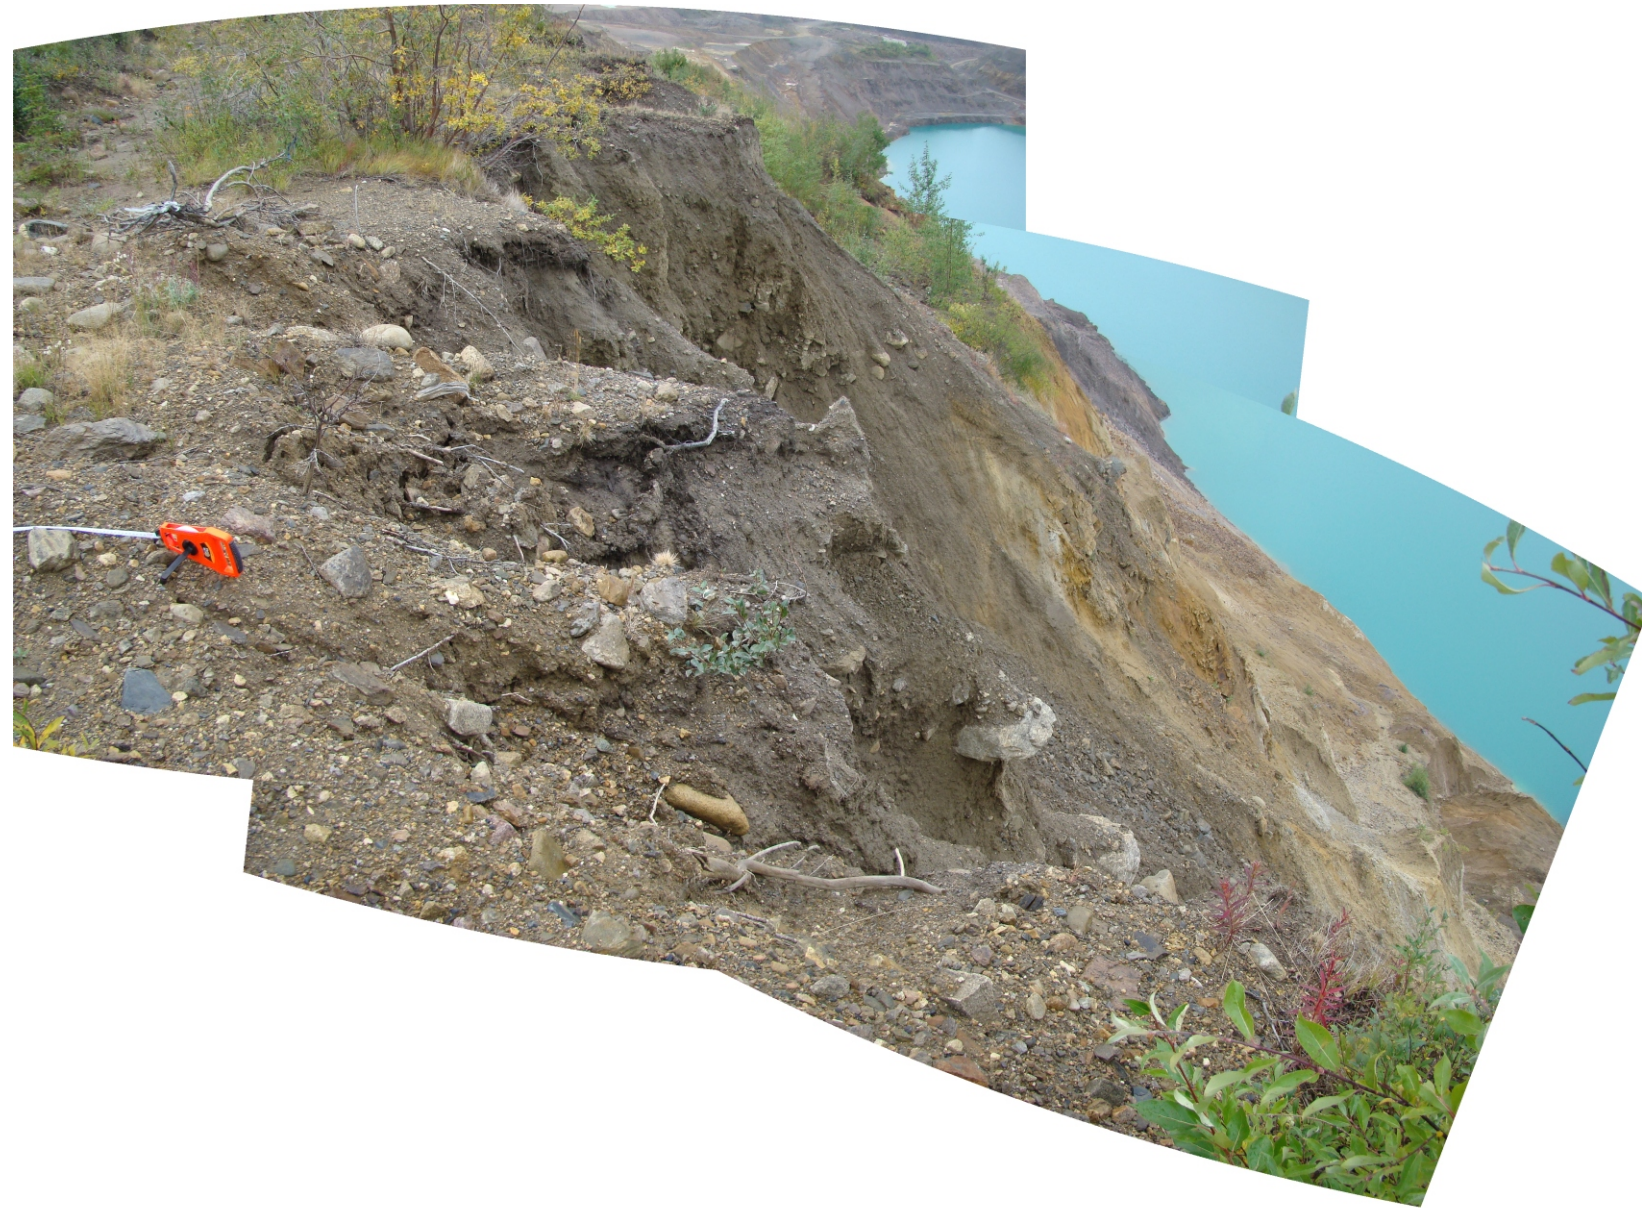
North instability zone. View of crest of the pit wall near reference bar 15355 (August 2009).
